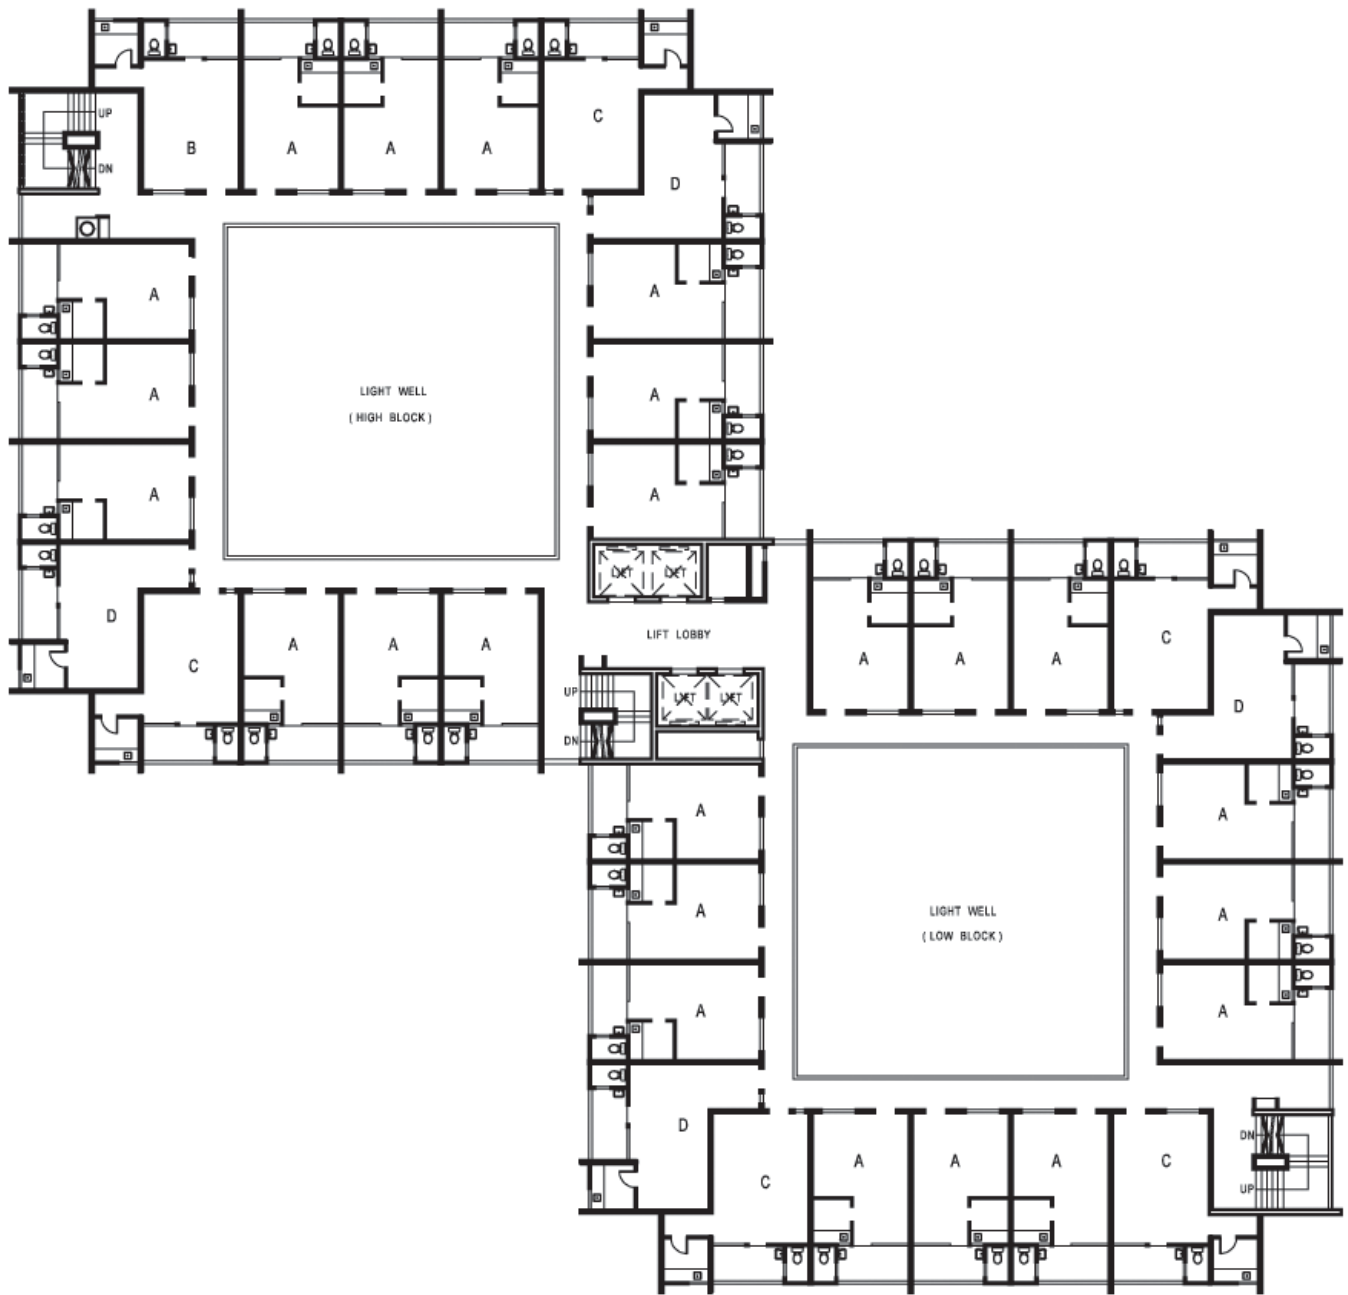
Standard Twin Tower Public Housing Floor Plan
